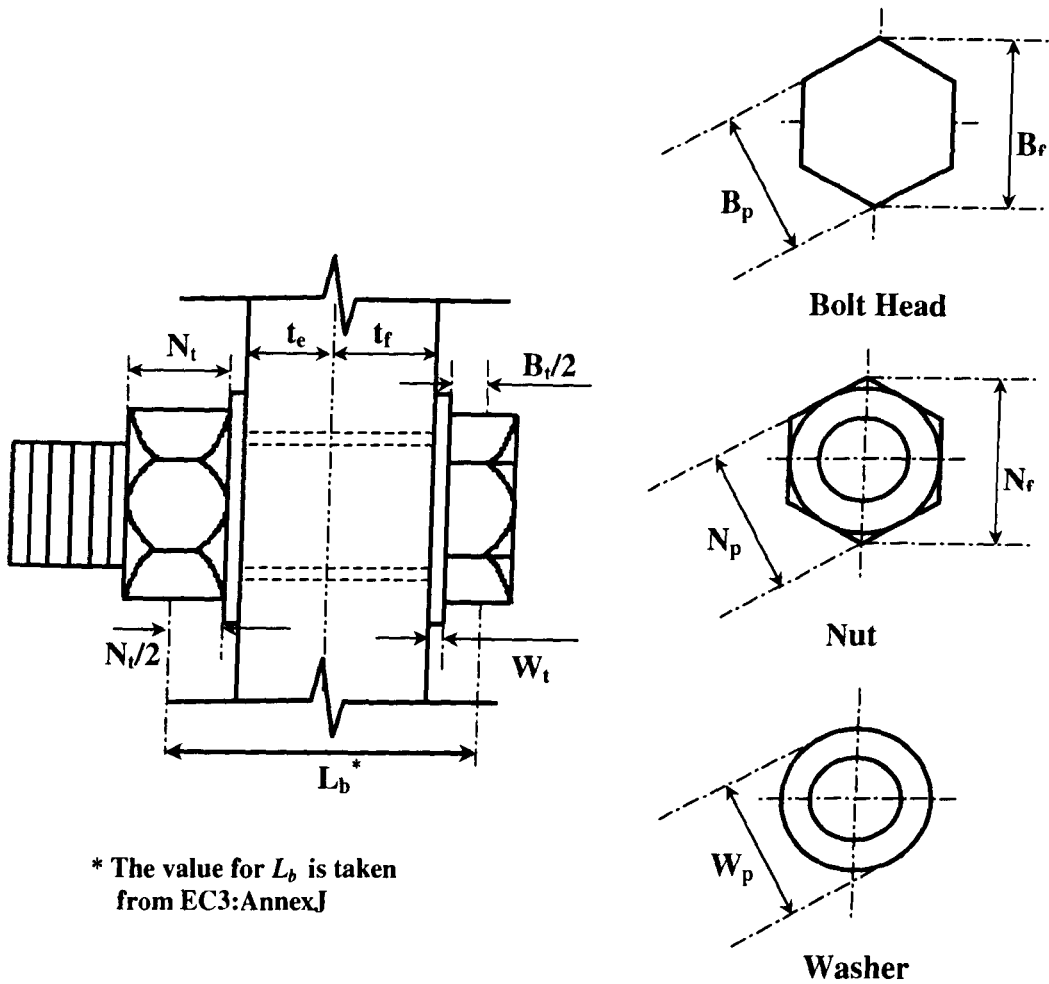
Detail of a bolt within an end plate to column T-stub connection
